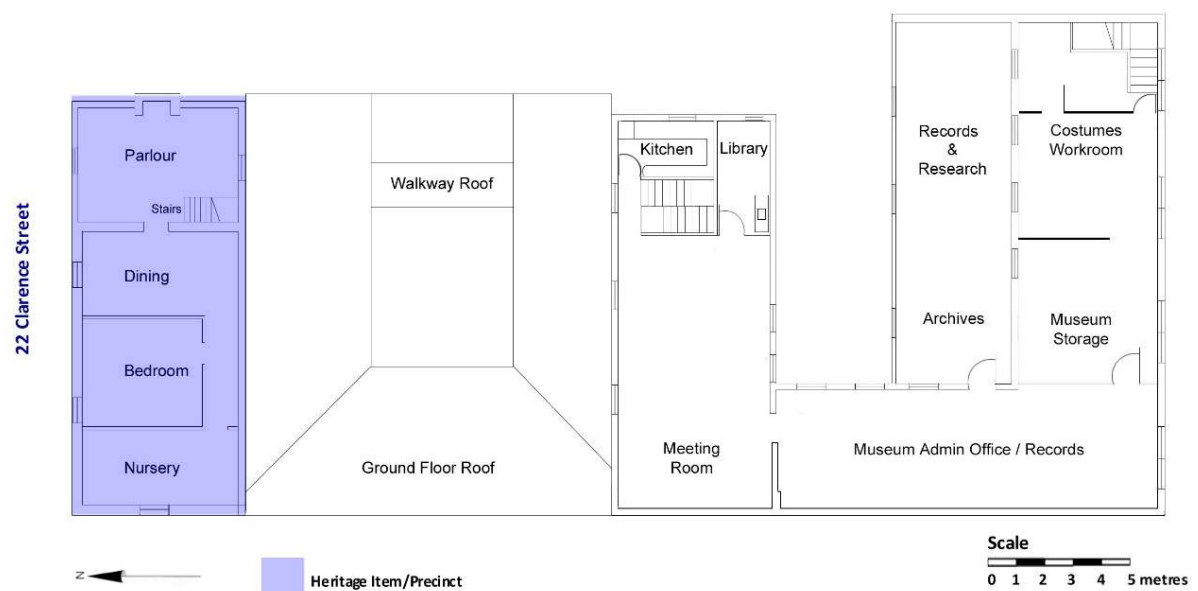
FIRST FLOOR PLAN SHOWING HERITAGE FABRIC/PRECINCTS
